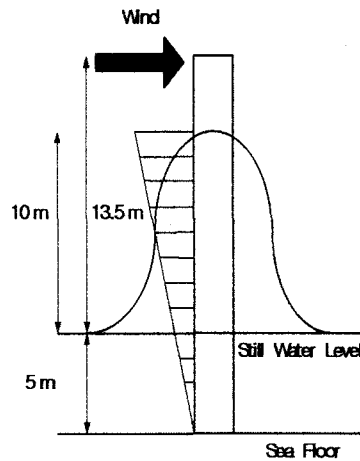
Cantilever Beam Model of Tubular Tower.(Off Shore)
